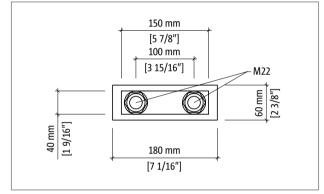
Schöck Isokorb® T Type S-N-D22: Elevation of the product
